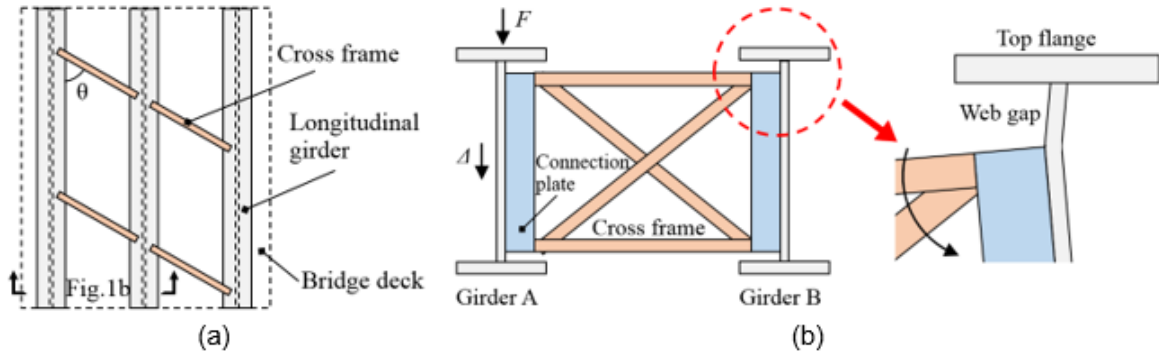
Schematic of a Girder Bridge Under Traffic Load
